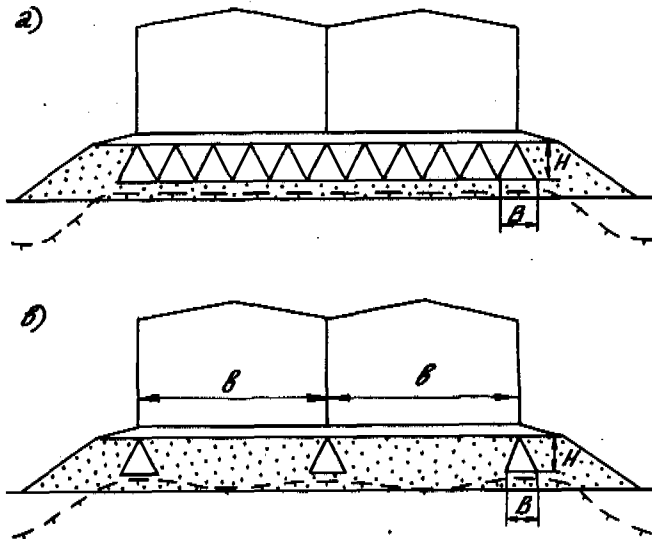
Cross-sectional views of beds with a plate foundation (a) and a strip foundation (b).
